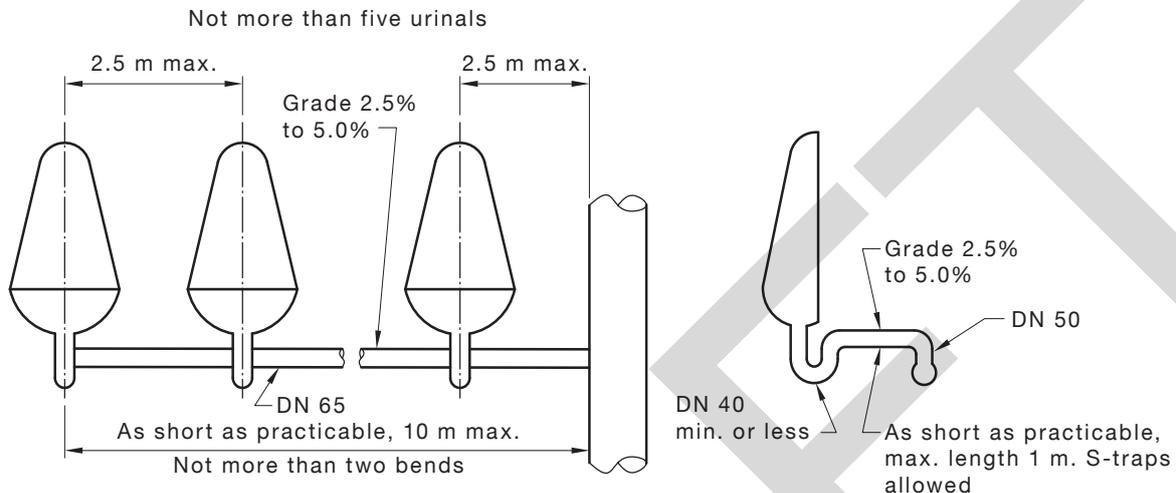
CONNECTION OF WALL-HUNG URINALS
